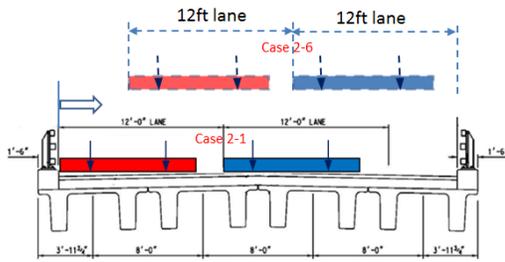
Loading profile for Case 2-1 (note: bridge section adapted from [2])
